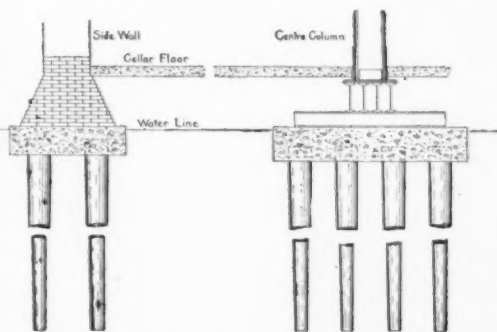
The familiar wooden pile foundation, with combination of spread footing and steel grillage.
